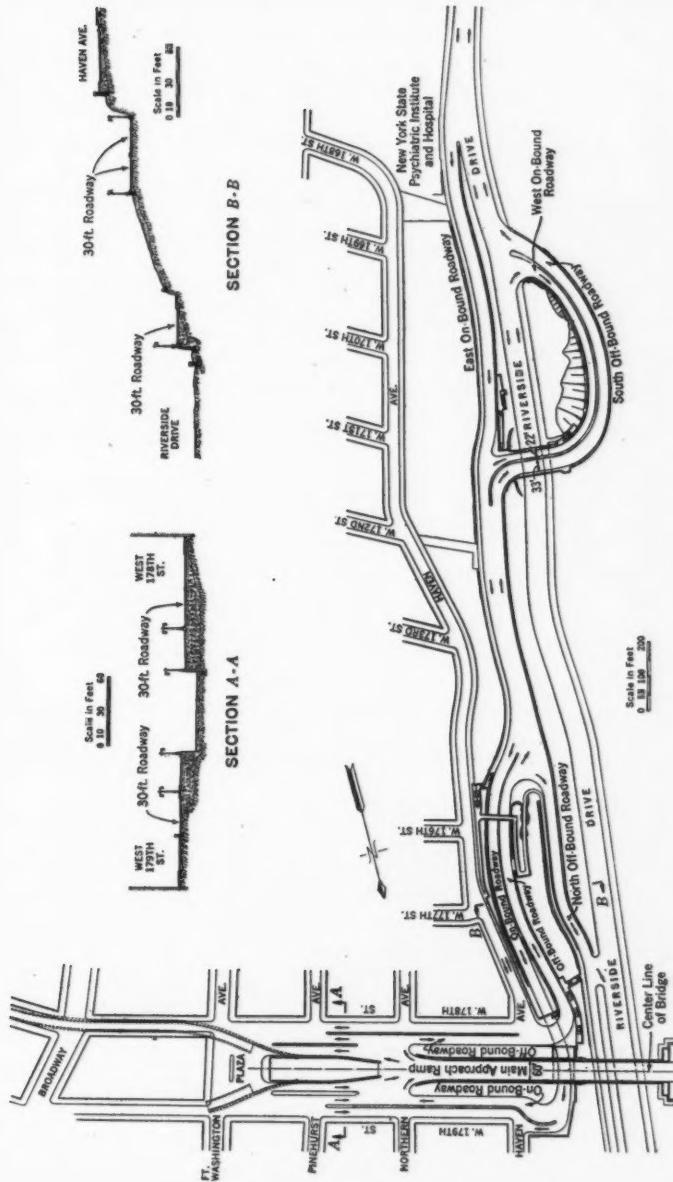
NEW YORK APPROACH, INITIAL CONDITION, INCLUDING RIVERSIDE DRIVE CONNECTIONS.
